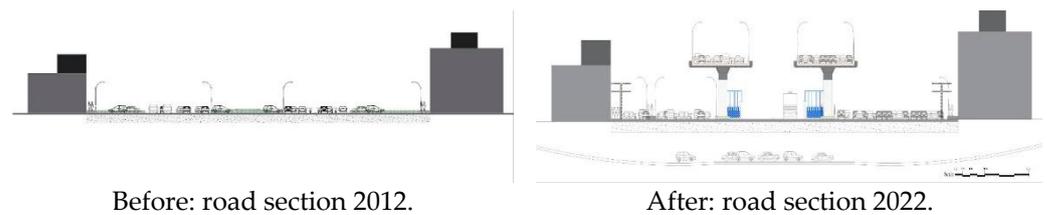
Transformation of a road section at Kalma Chowk Station (adapted from [52]).
